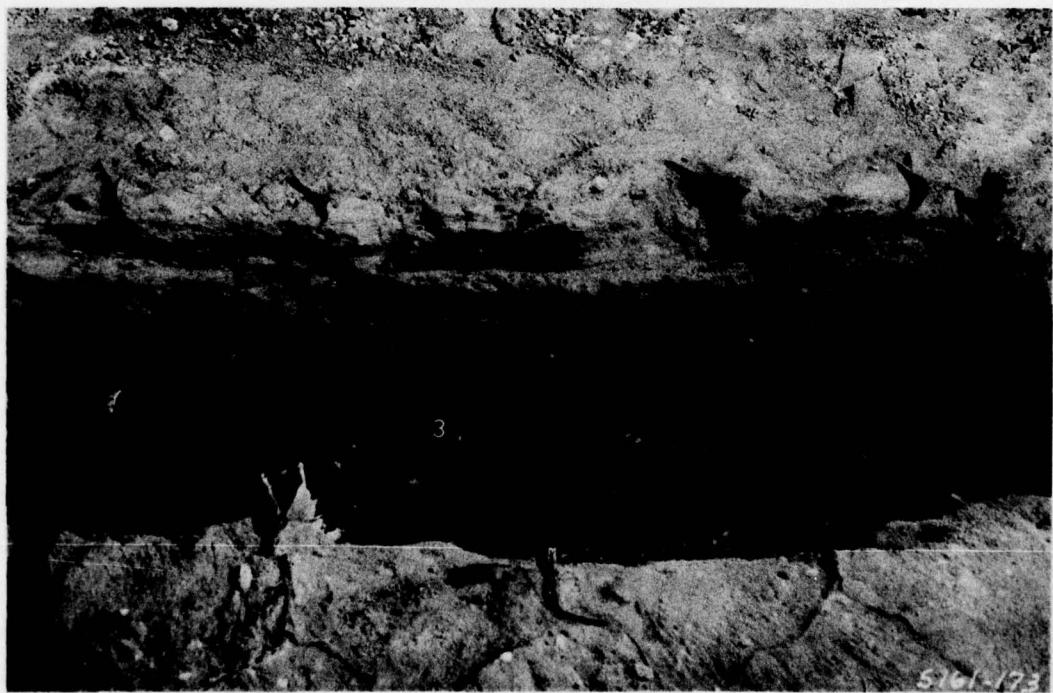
Trench in Test Section No. 5, item 3, after traffic
